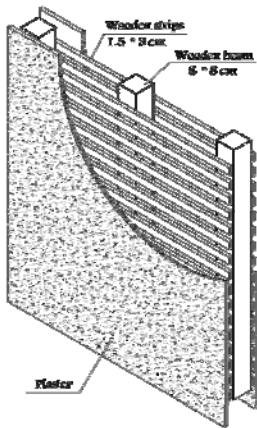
Construction Detail of the Baghdadli Wall made of two layers of wooden strips over beam of 8*8cm plastered from inside and outside with sand and lime mortar
